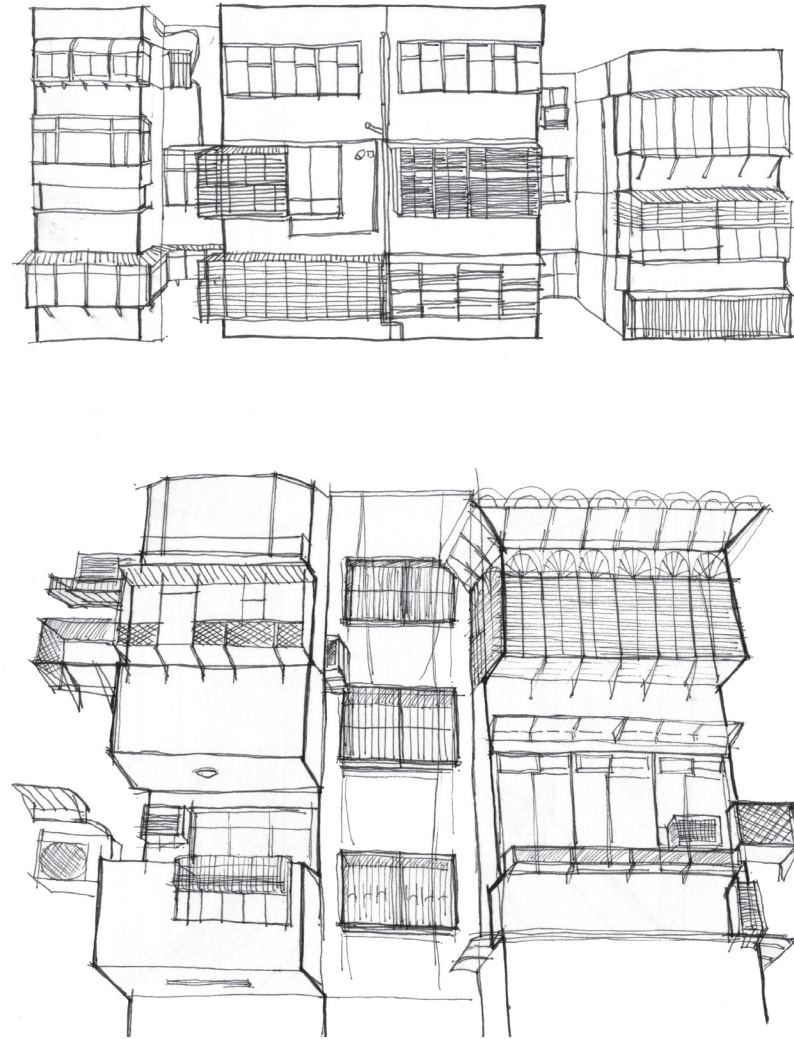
Sketches of add-on facades in Daan district Taipei
